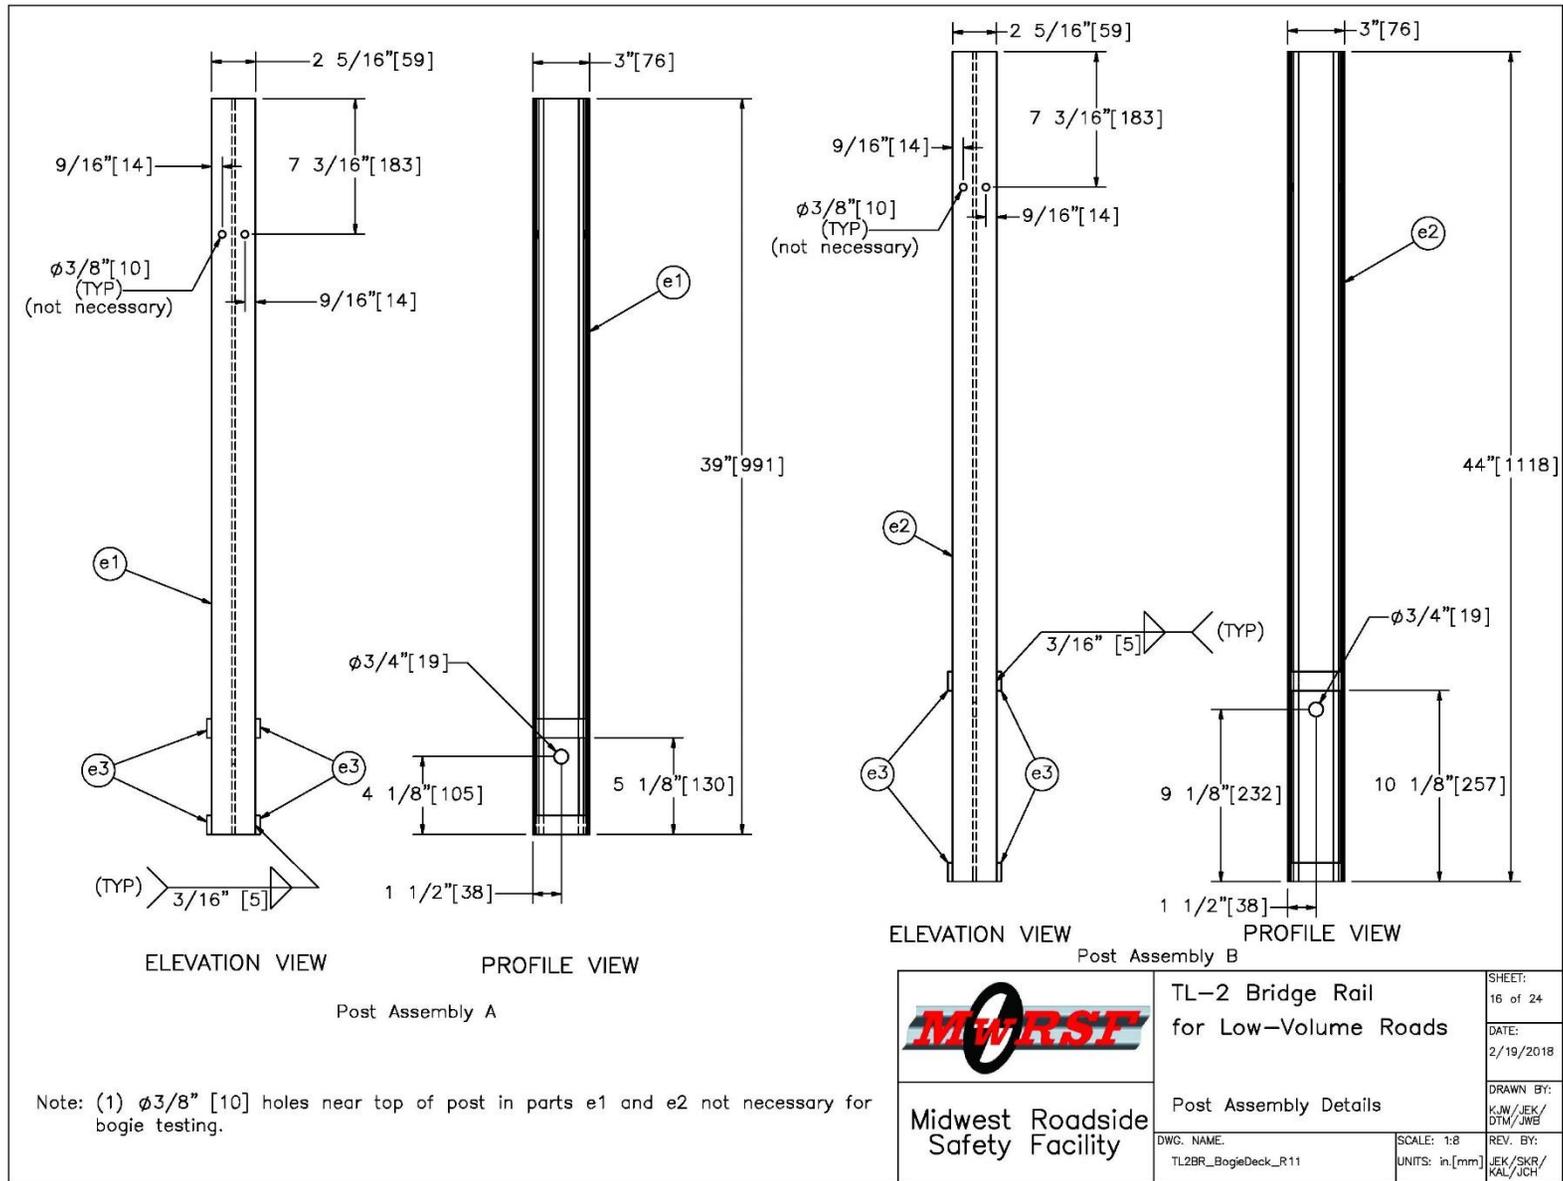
Bogie Testing Matrix and Setup, Post Assembly Details
